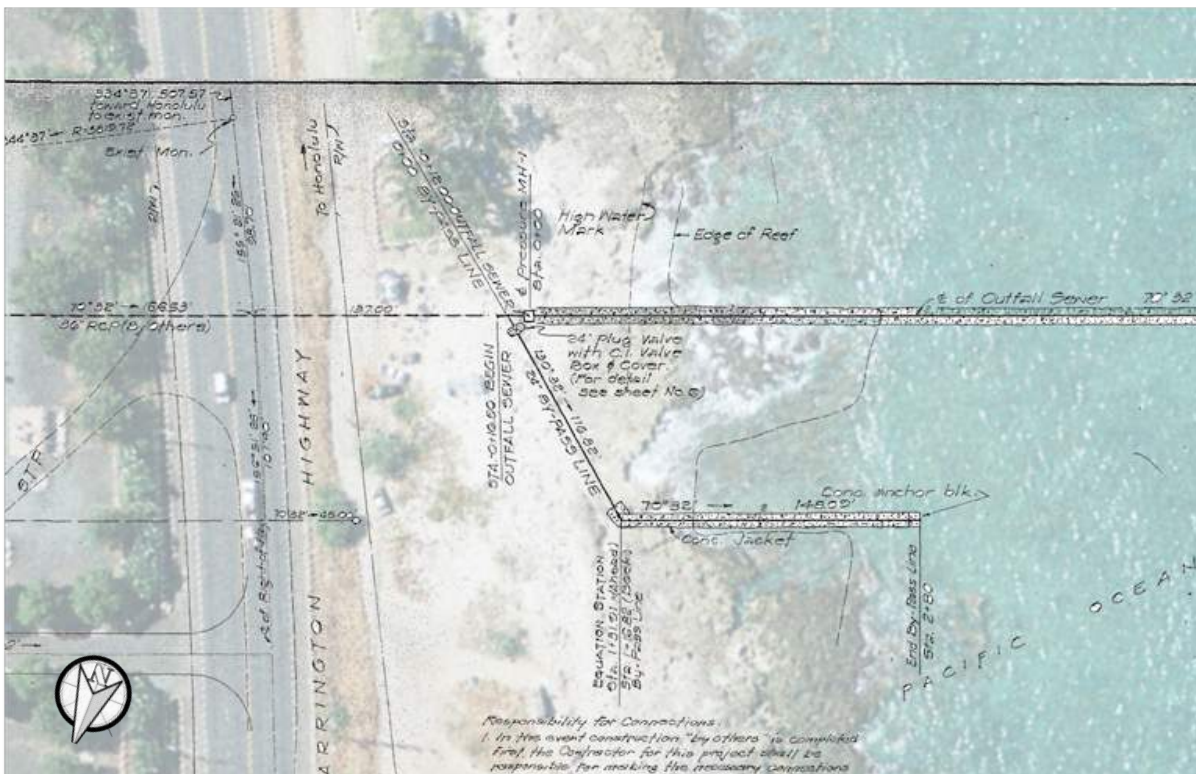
Outfall landing condition, 2007, with as-built plan overlay (source: UH CGG, 2019)
